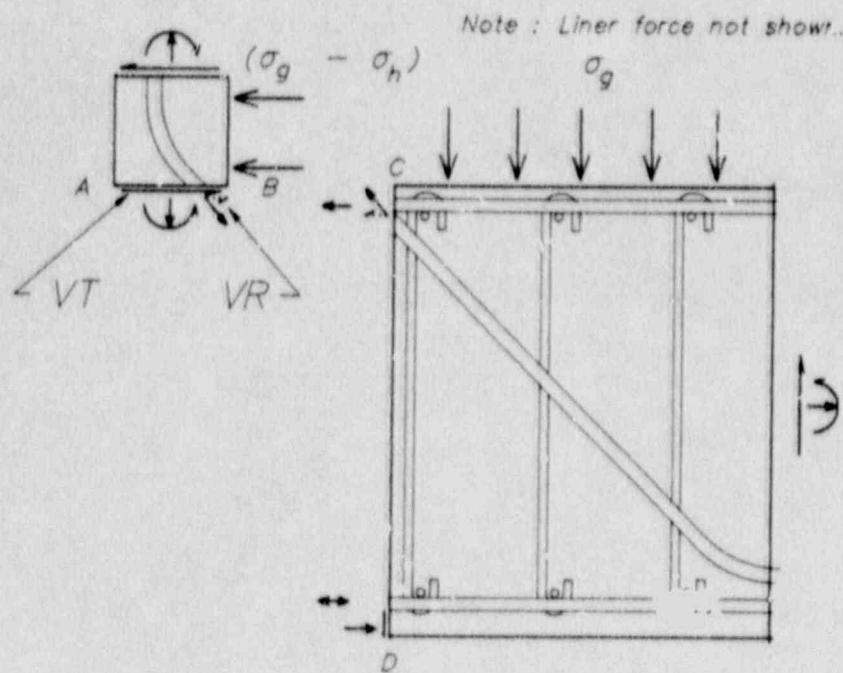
Idealized Internal Forces at Wall-Slab Connection
